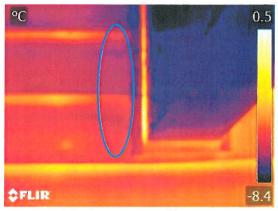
Air leakage at typical beam connection Photo 8: Location of thermal image
